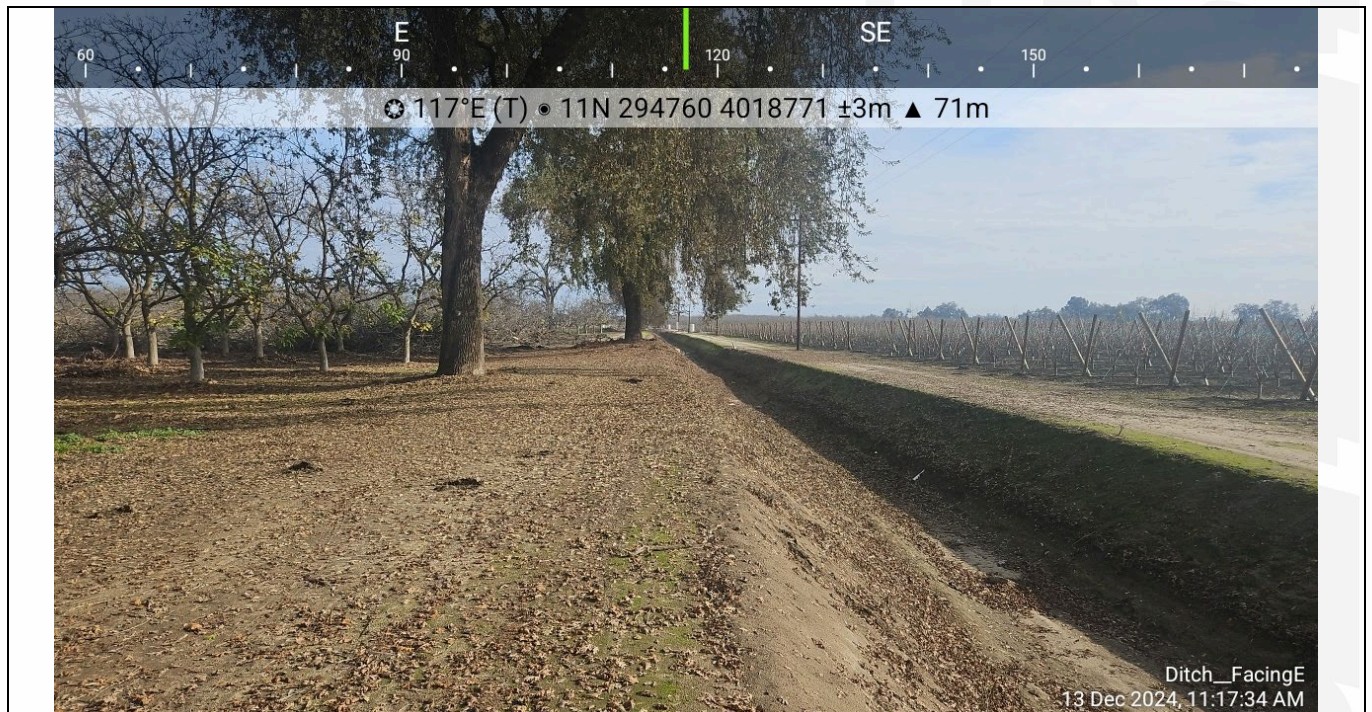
View of Tulare Irrigation Canal on the southern boundary of the project area facing east.
